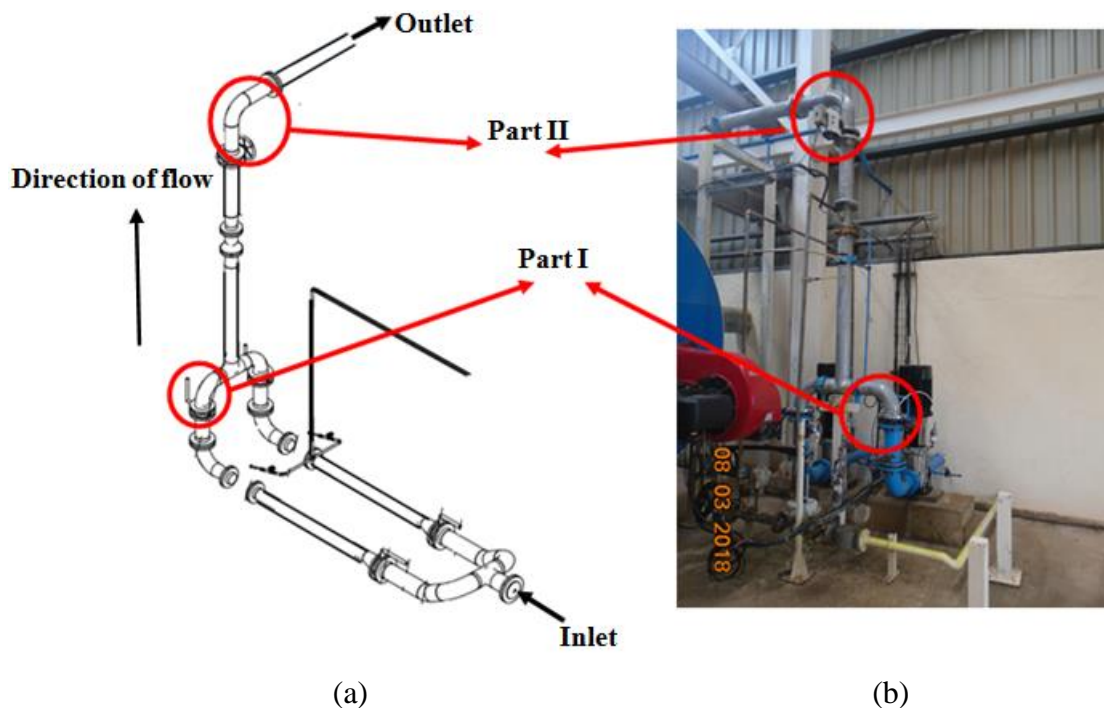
(a) A schematic view of the carbon steel elbows at the corroded location and (b) a photo-digital image of the real installed elbows.
